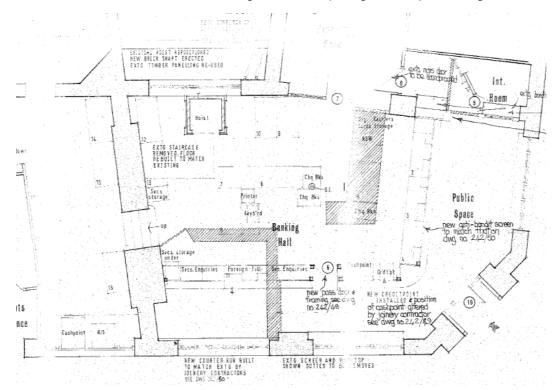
1980 Proposed ground floor plan, Planning Ref. HB2583
